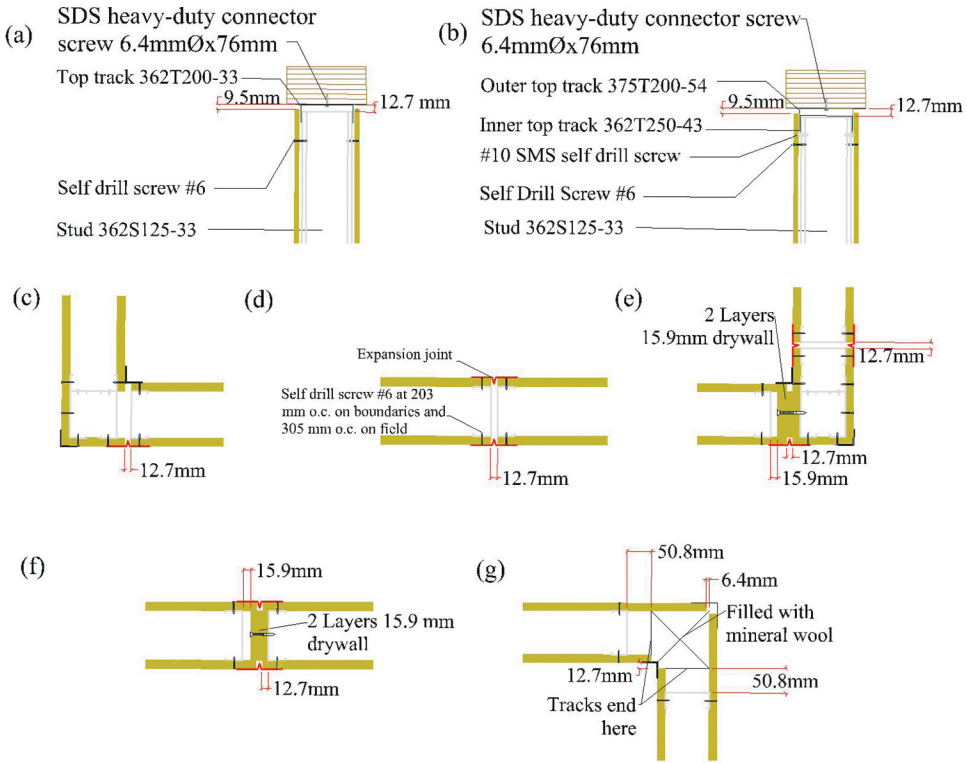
Details adopted in phases 1 and 2 for damage reduction; (a) slip-track connection, (b) telescoping connection, (c) wall intersection non-fire-rated expansion joint, (d) interior non-fire-rated expansion joint, (e) wall intersection fire-rated expansion joint, (f) Interior fire-rated expansion joint, (g) corner gap detail.
